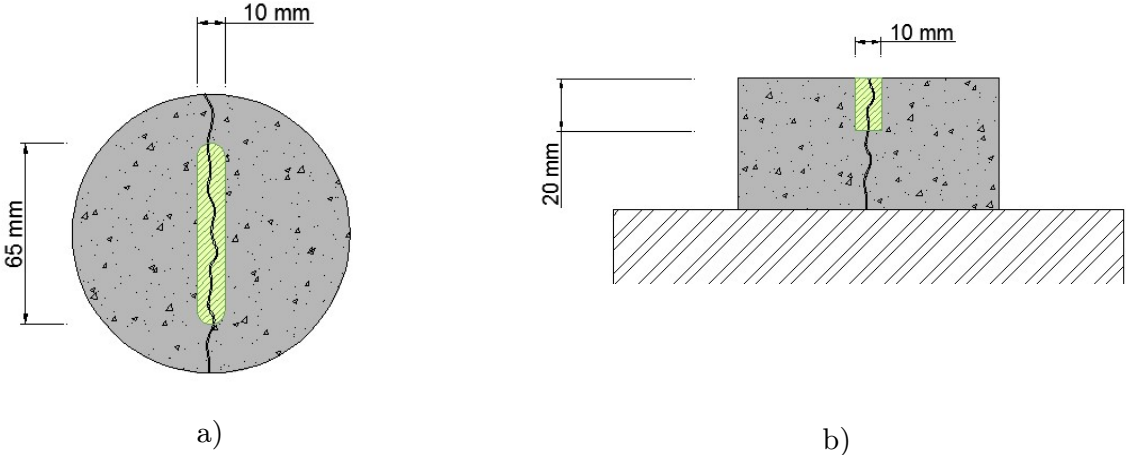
Schematic representation of grinding in a zone around crack; a) top view b) side view
